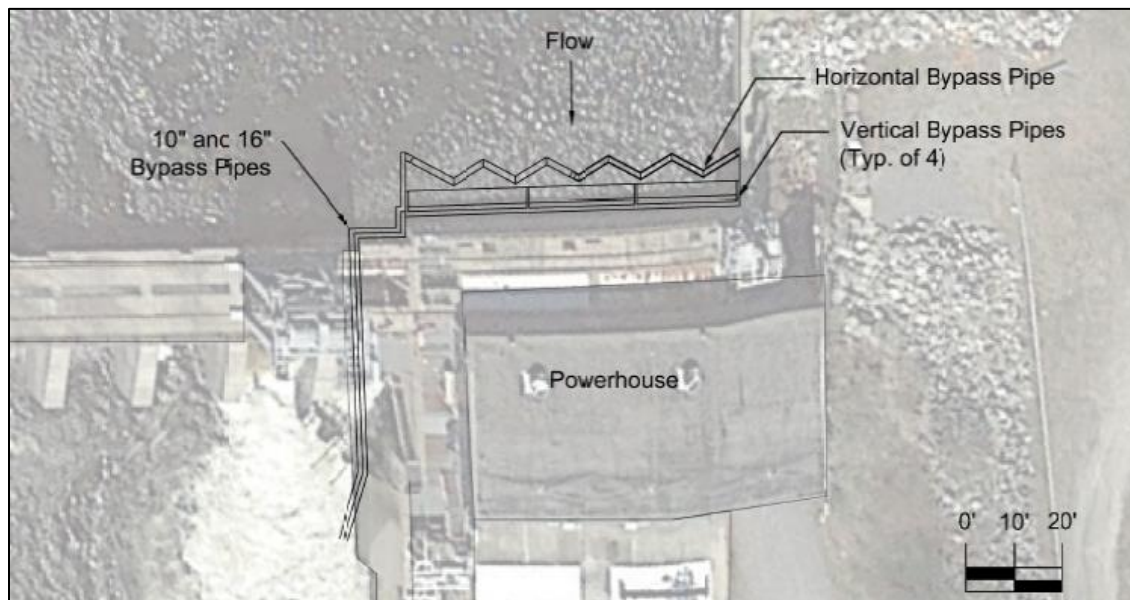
Conceptual design of vertical and horizontal zig-zag eel bypasses installed at Worumbo (plan view).
